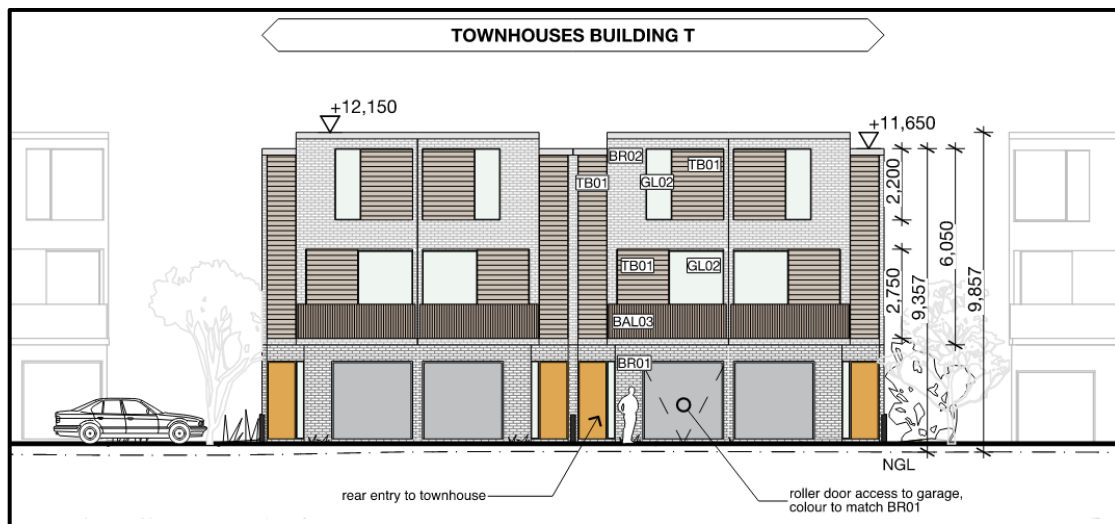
The elevation view of the townhouses in Building T showing the rear of the townhouses with first floor balconies.
